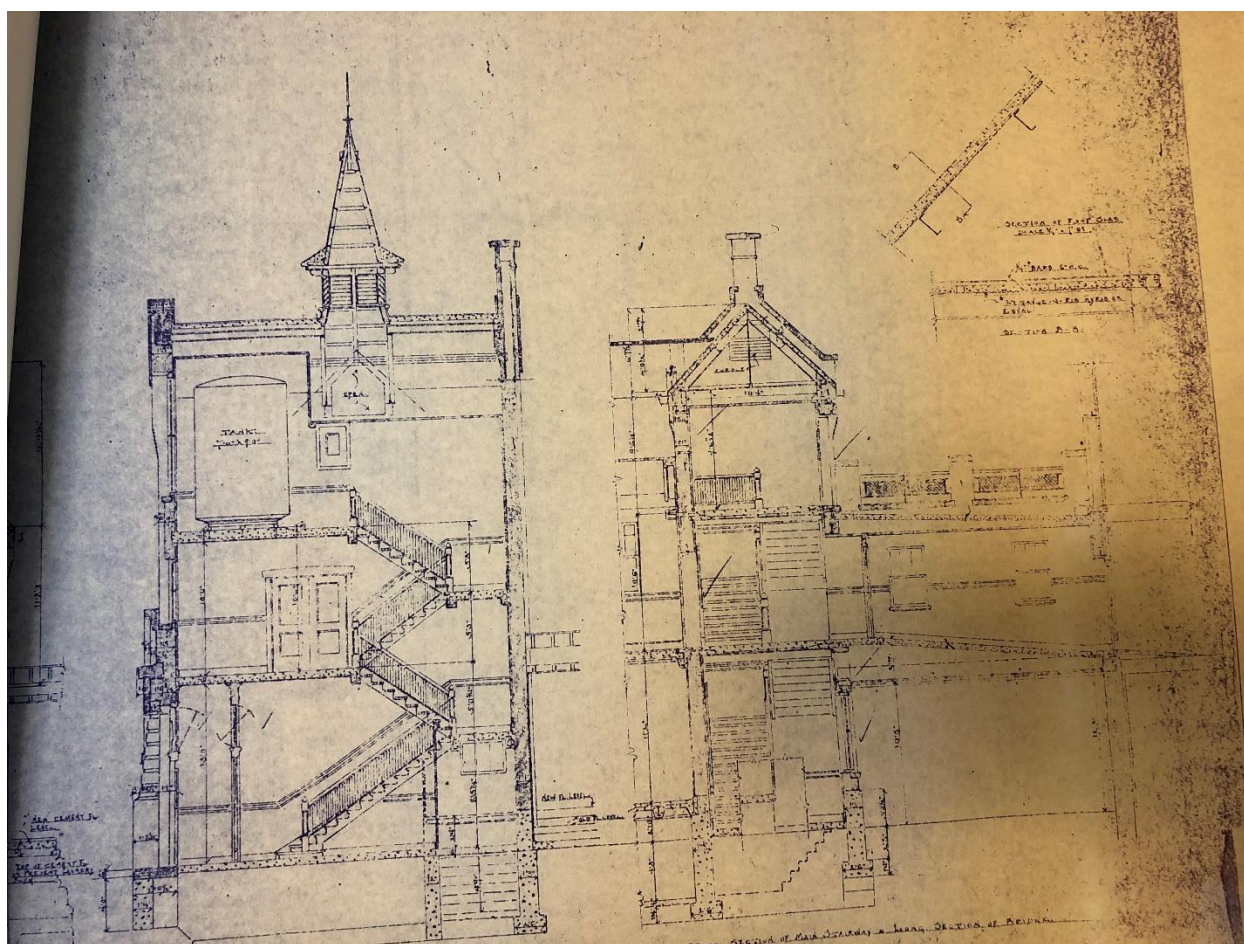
Frommann and Jebson, undated drawing showing stairway section of the Laundry/Chapel Building at Altenheim, which the architects label as “Laundry and Meeting Hall.” Drawing was likely made in 1916 after a fire destroyed the original laundry/chapel building. Source: Altenheim Archives.
